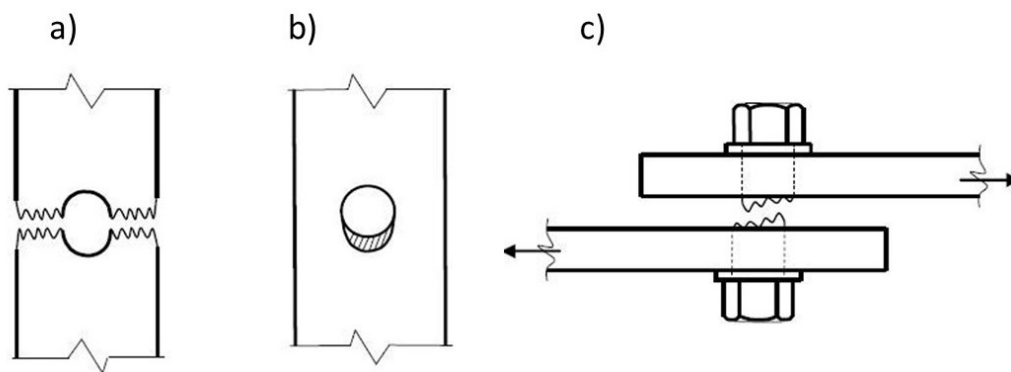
Failure modes of bolted lap joints a) net section, b) bearing and c) bolt in shear
